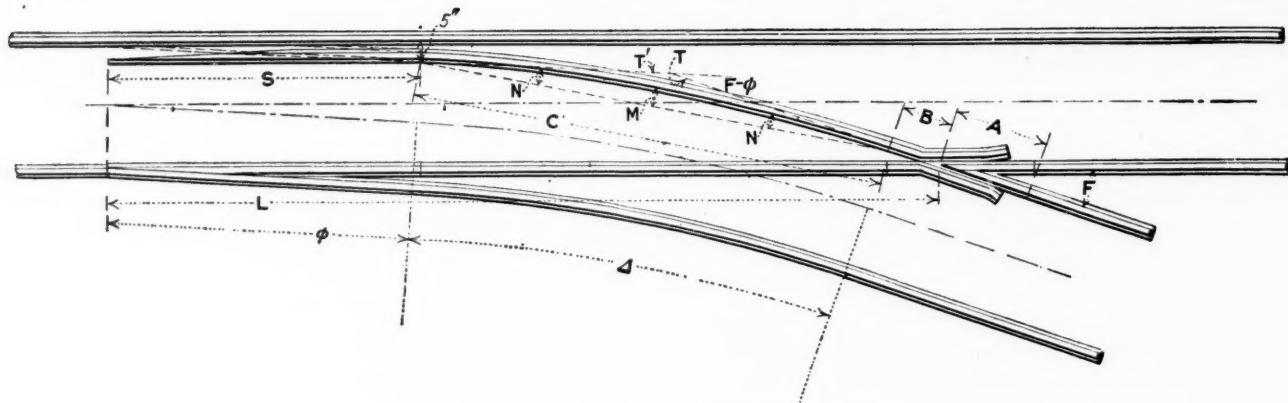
PLAN OF TYPICAL TURNOUT LAYOUT
